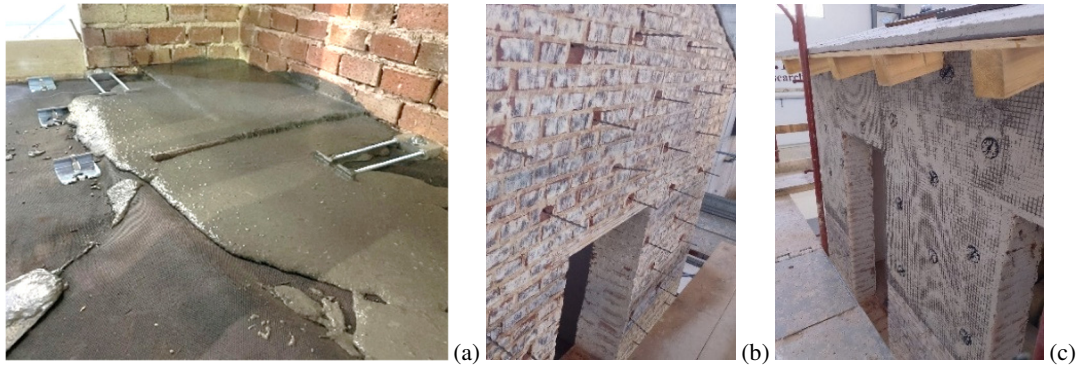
Views of the retrofitting phases: (a) EFS configuration, concrete cast and views of connectors; (b) EFS+RW configuration, arrangement of the transverse stainless dowels; (c) EFS+RW configuration, arrangement of the first FRCM mortar layer and basalt grid.
